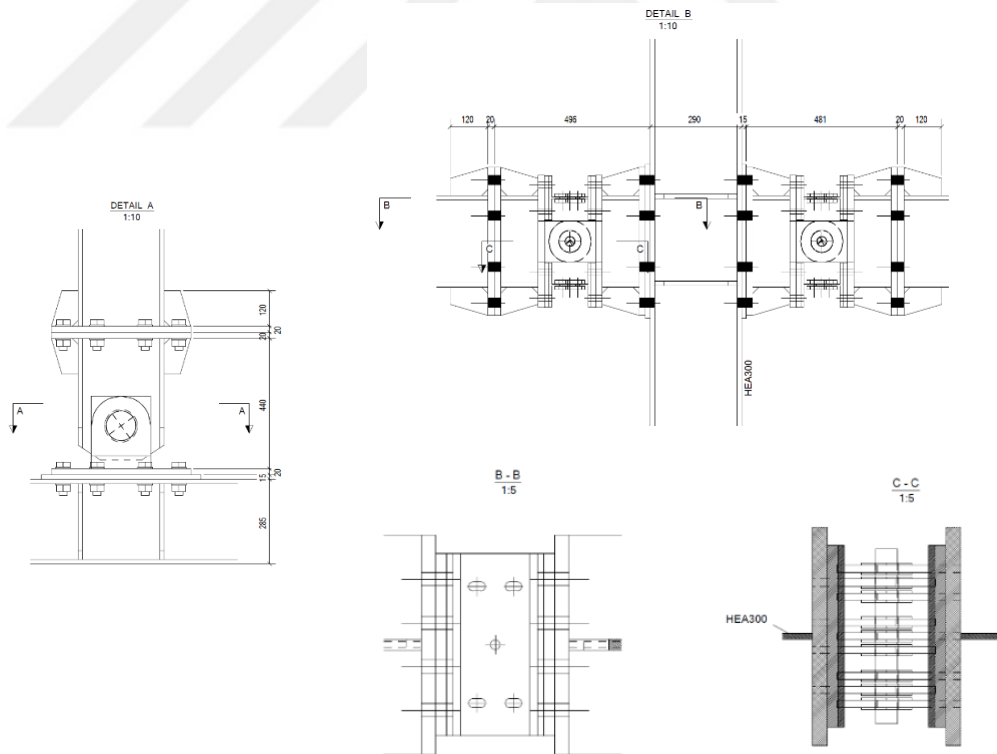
Detail views of the test frame. Dimensions in mm.
